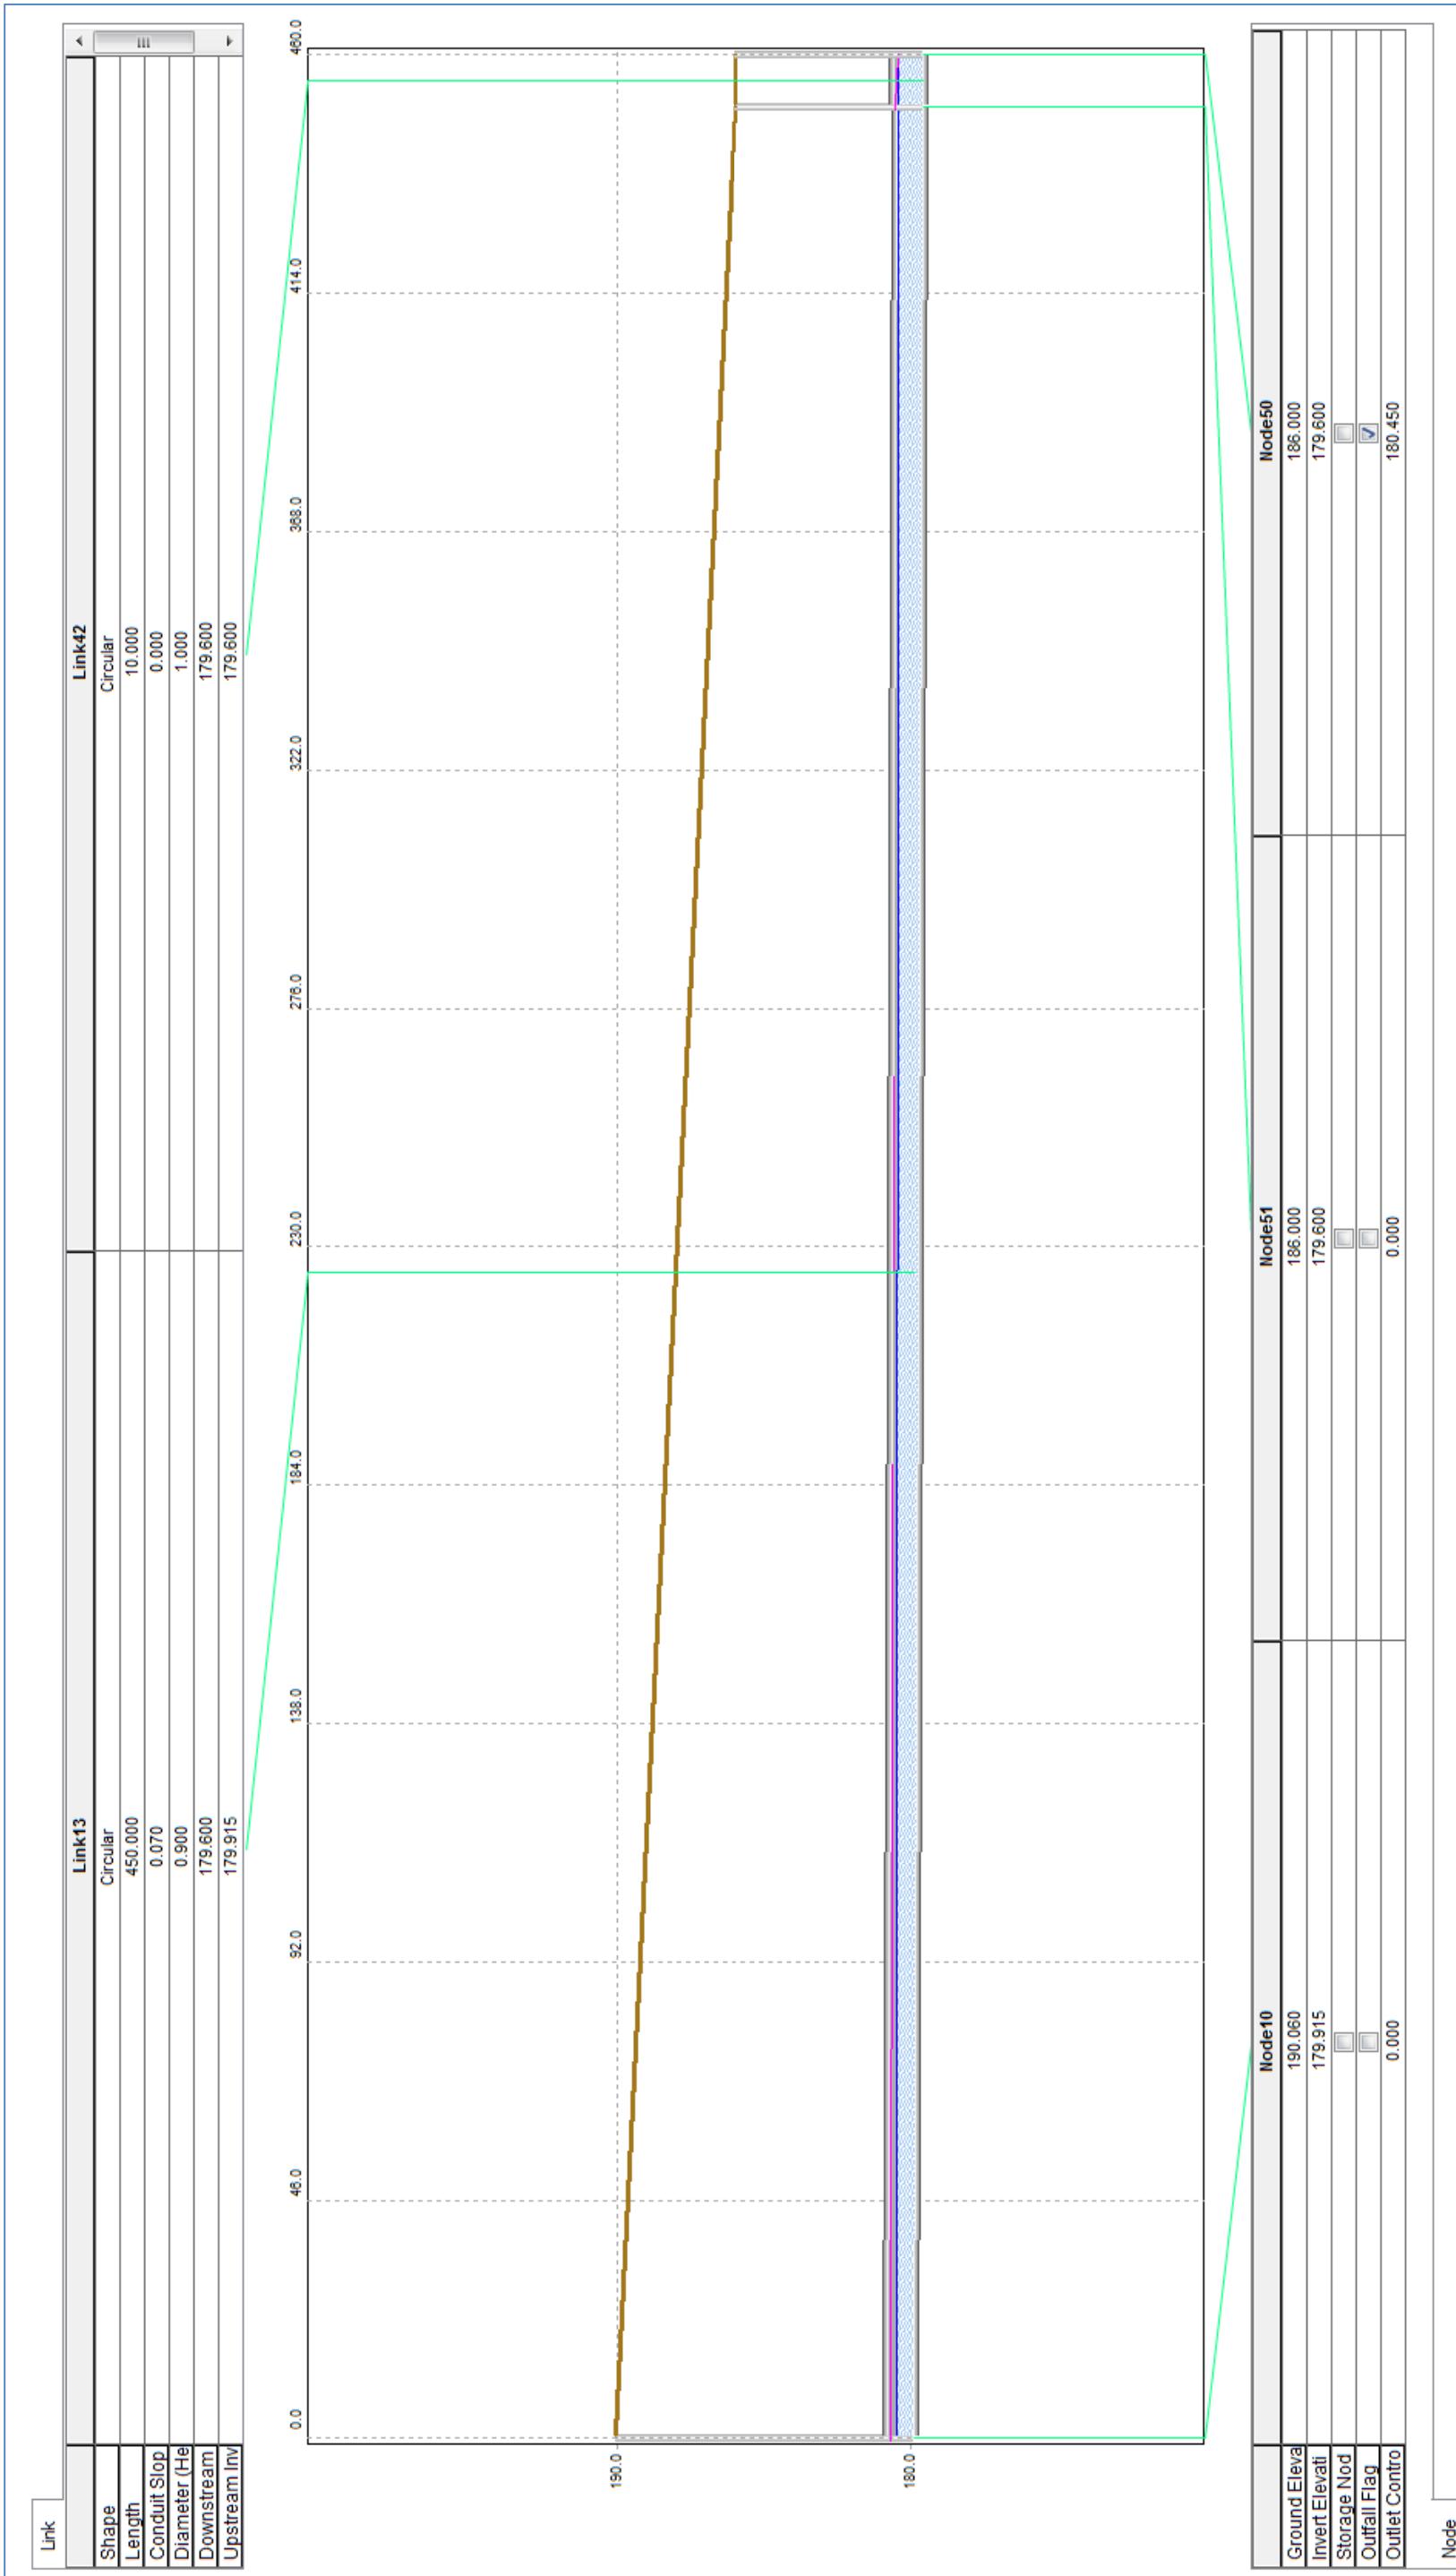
Lauzon Parkway Extension (Sta. 10+900 - 11+350) - Permanent Pool Elevation + 1.0m Backwater Condition
